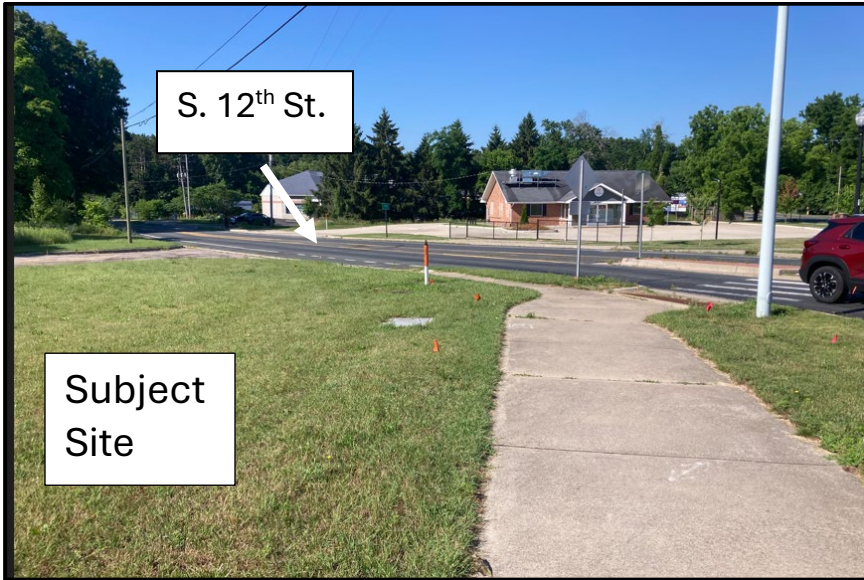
Looking south at subject site toward S. 12th Street. Buildings in background are located in Texas Township.
